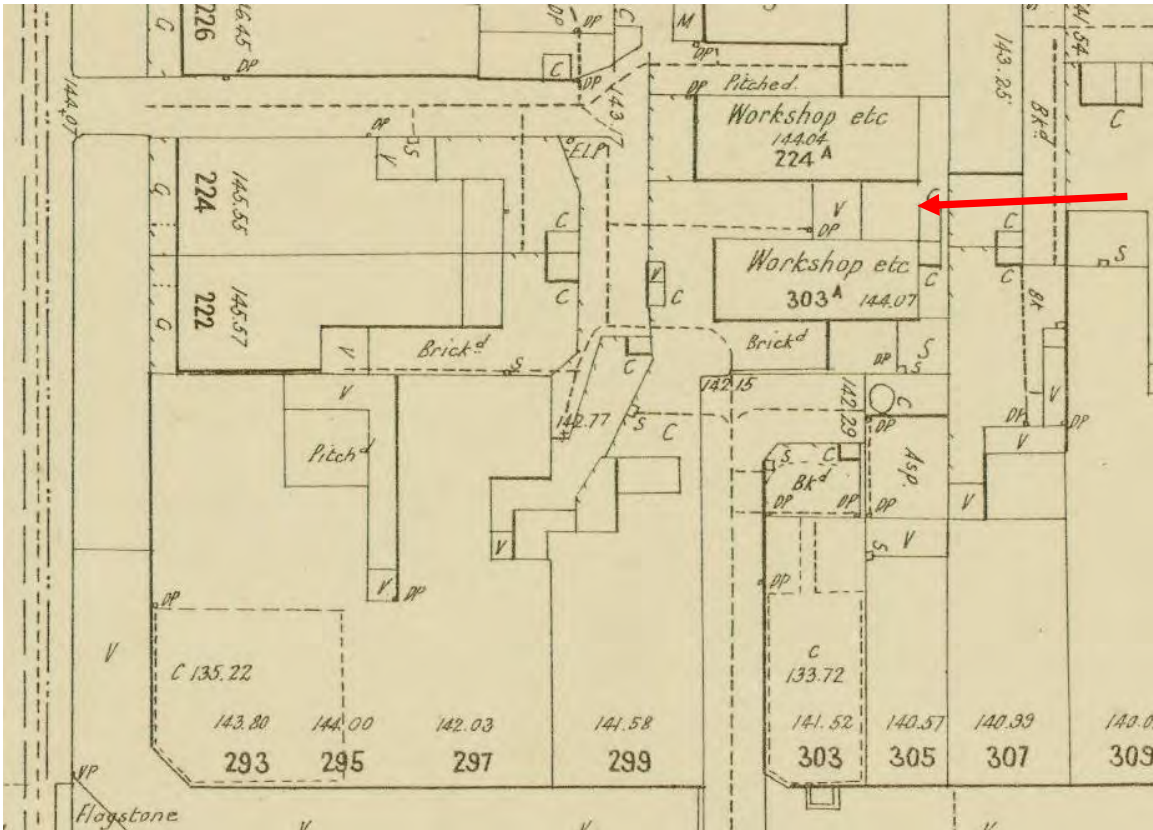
MMBW detail plan no. 1171, 1897, showing the intersection of Station and Elgin streets, with two workshops set back from the street (indicated)
